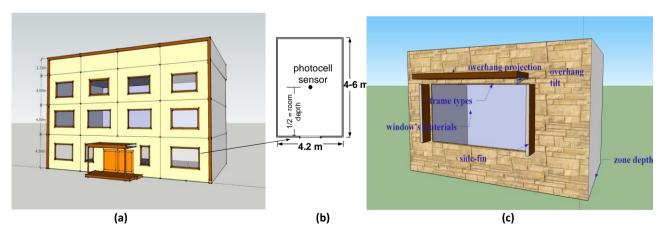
Schematic of the common residential houses layout (a) Front view of the house (b) Plan view of ground-floor living room (c) zone's axonometric view
